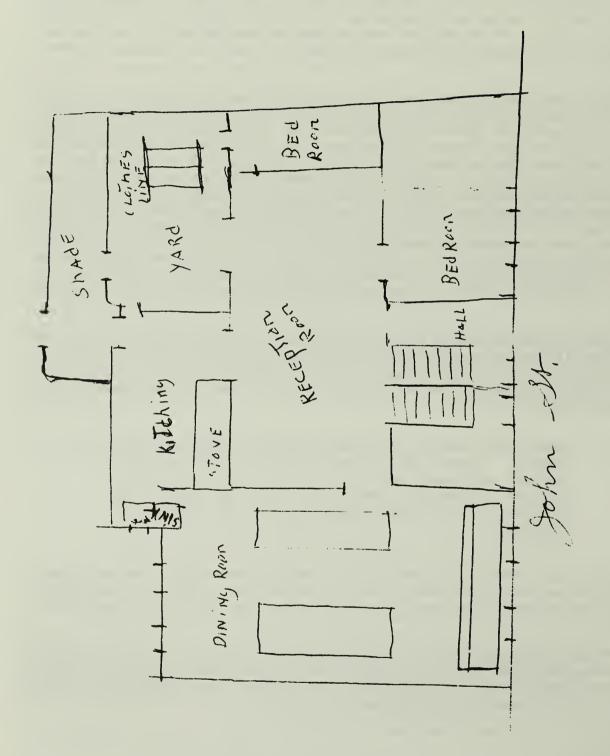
Blanche Graham's sketch plan of the John St. boardinghouse in which she lived.
